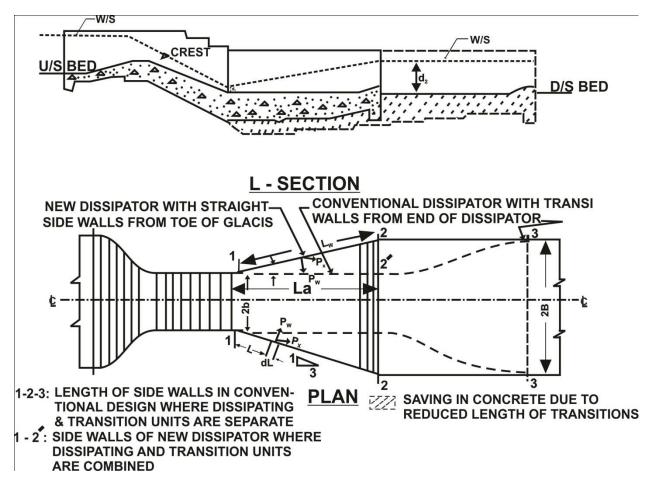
Plan & Sectional View of a Canal Fall Showing Proposed Design (Full Line) and the Conventional Design (Dotted line)
